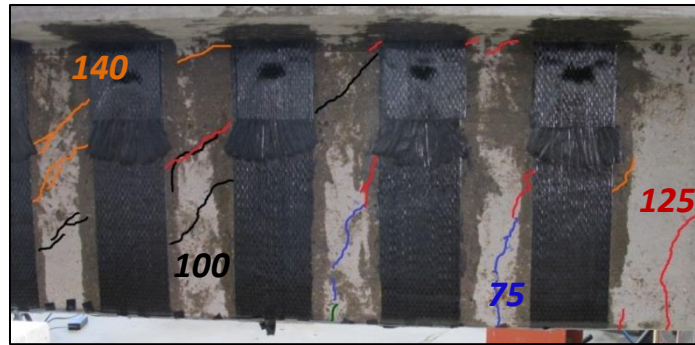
Cracking pattern of east face 8-3-Uni
